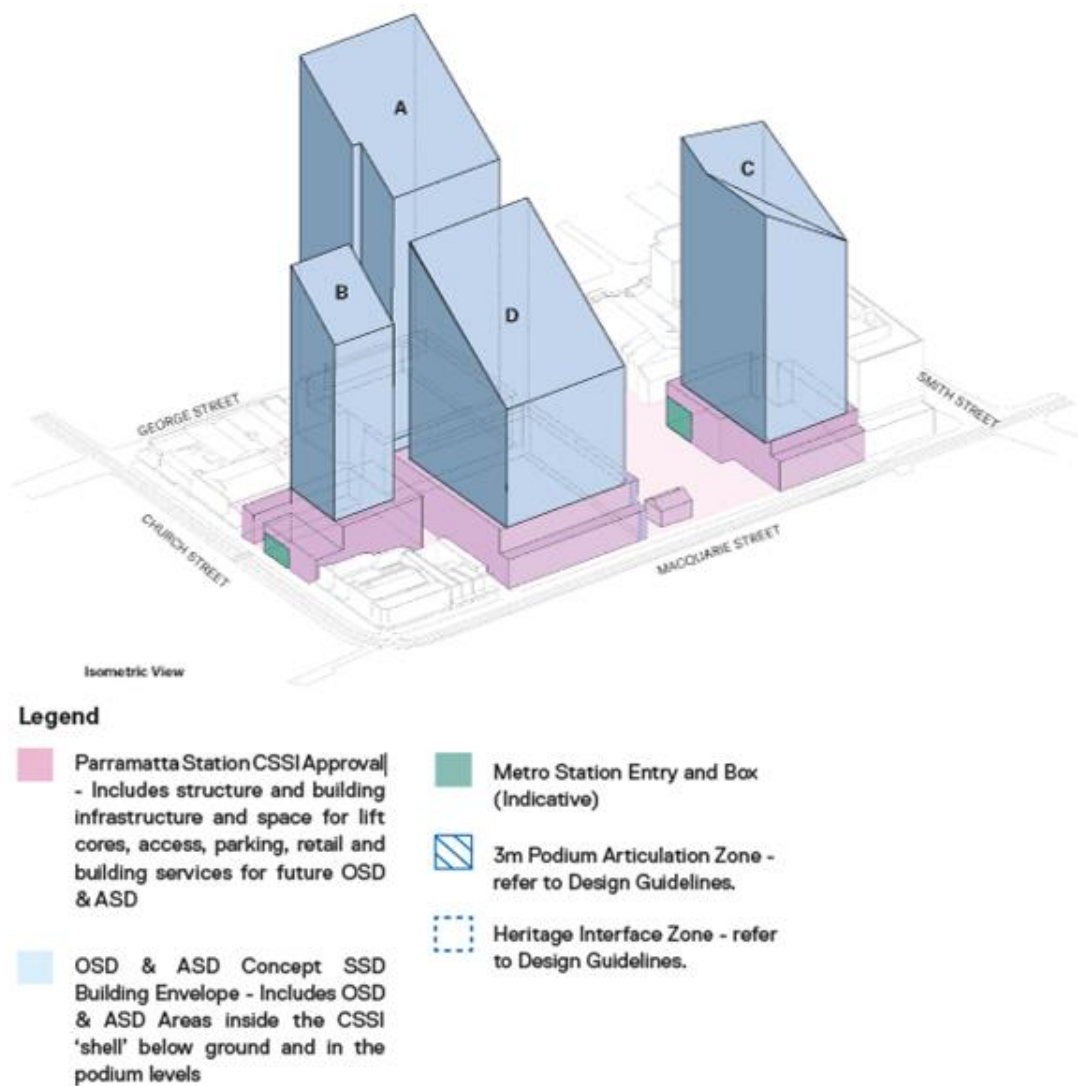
Proposed Concept SSDA development and CSSI scope
